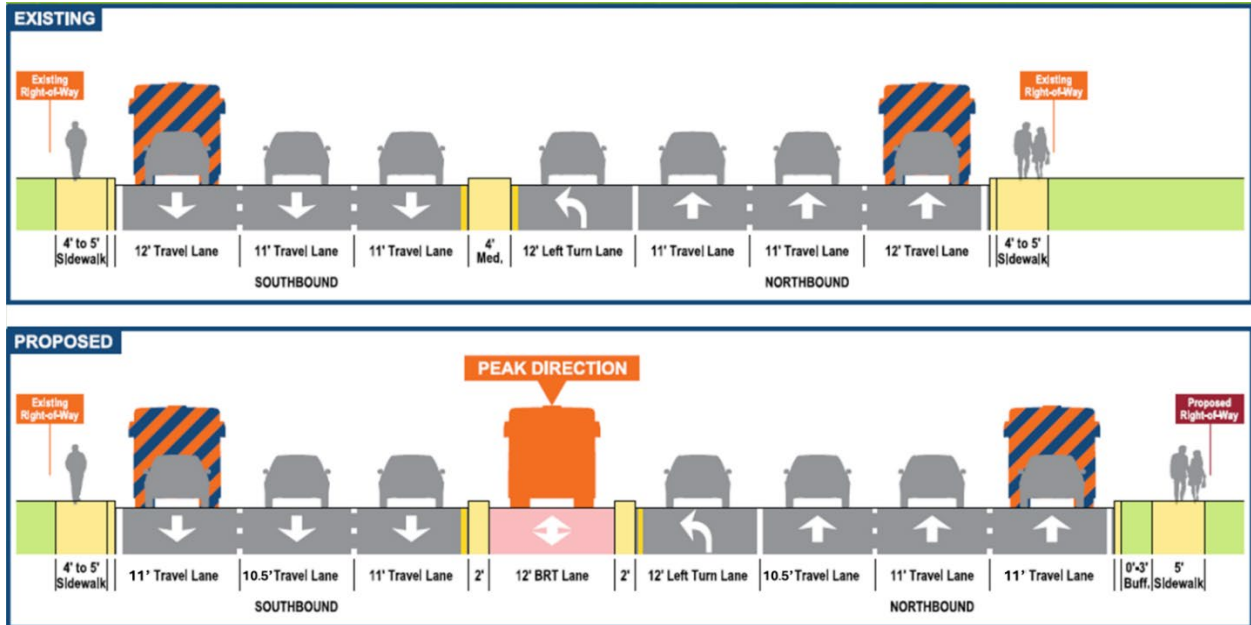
Existing and Proposed Cross-Section from Timberwood Avenue to Burnt Mills Shopping Center
